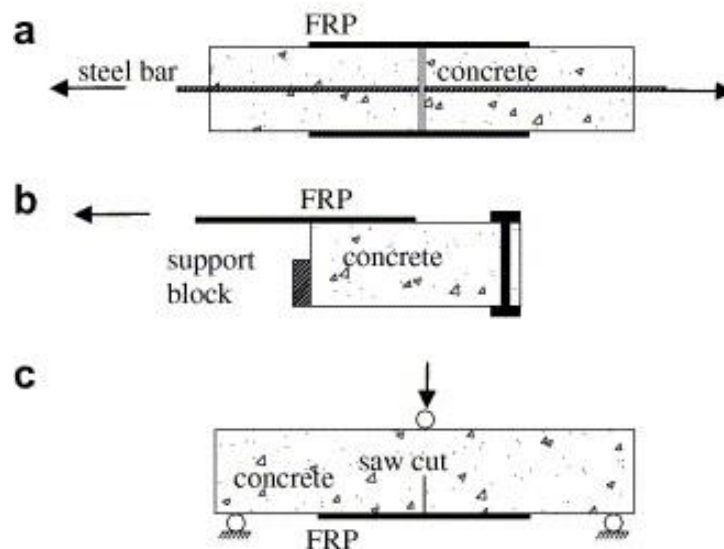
Experimental set-ups for shear-lap tests: (a) double pull–pull test; (b) single pull–push test and (c) bending test.
